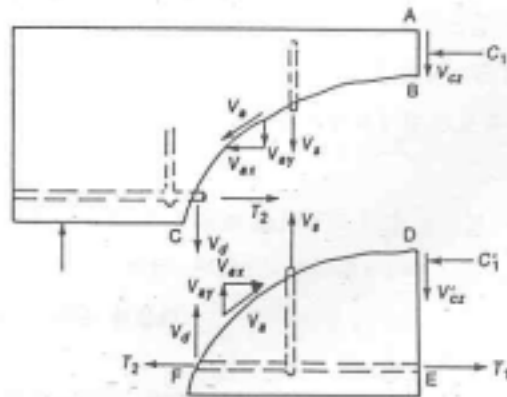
Internal forces in a cracked beam with stirrups
